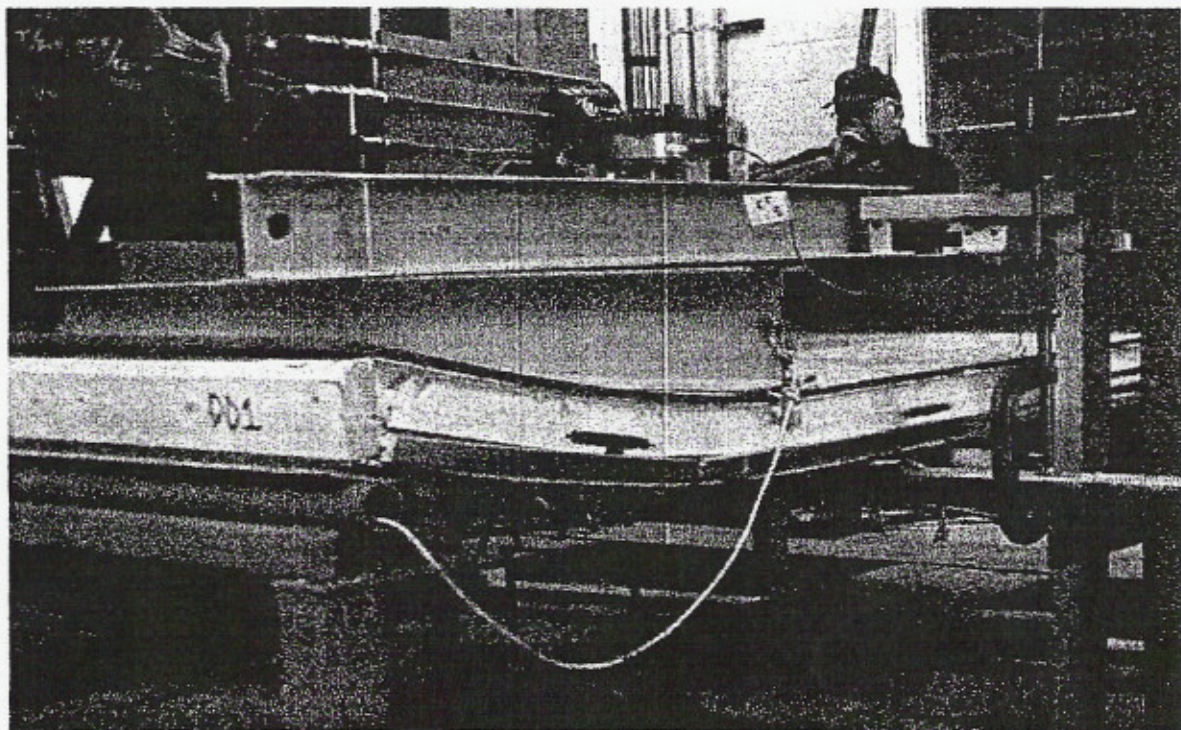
Failure of 8' OSB-OSB Panel Under Transverse Loading
